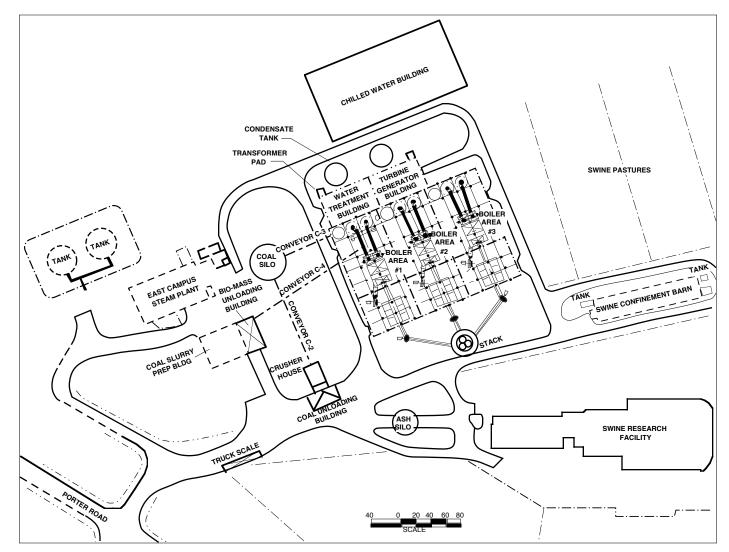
PLAN VIEW OF THE THREE-BOILER LAYOUT AT THE EAST CAMPUS STEAM PLANT
